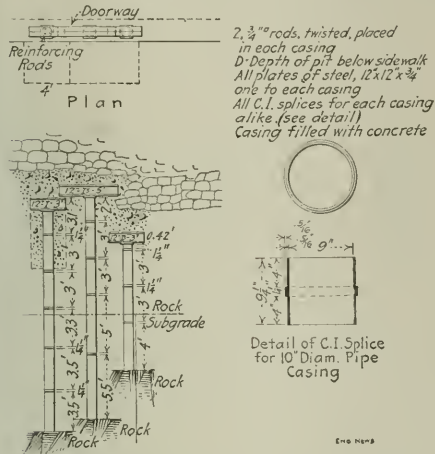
UNDERPINNING BUILDINGS WITH STEEL-PIPE PILES FILLED WITH CONCRETE
